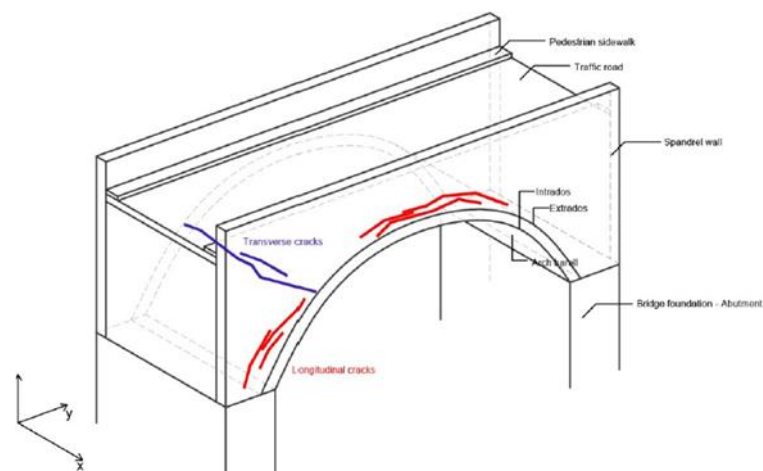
Three-dimensional layout of cracks in masonry arch bridges (Sokolović et al., 2021)
